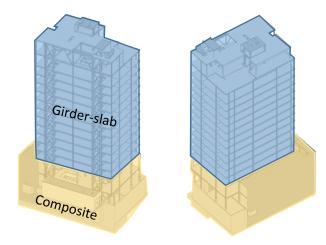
Existing structural Skeleton of AC Hotel Philadelphia.
